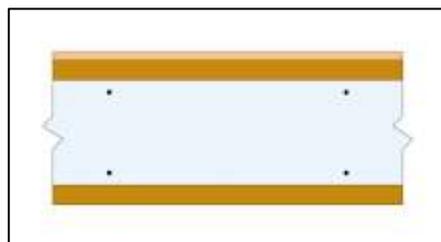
end view of the installation of 12.5 mm (1/2 in.) regular gypsum board flange-to-flange of I-joist
